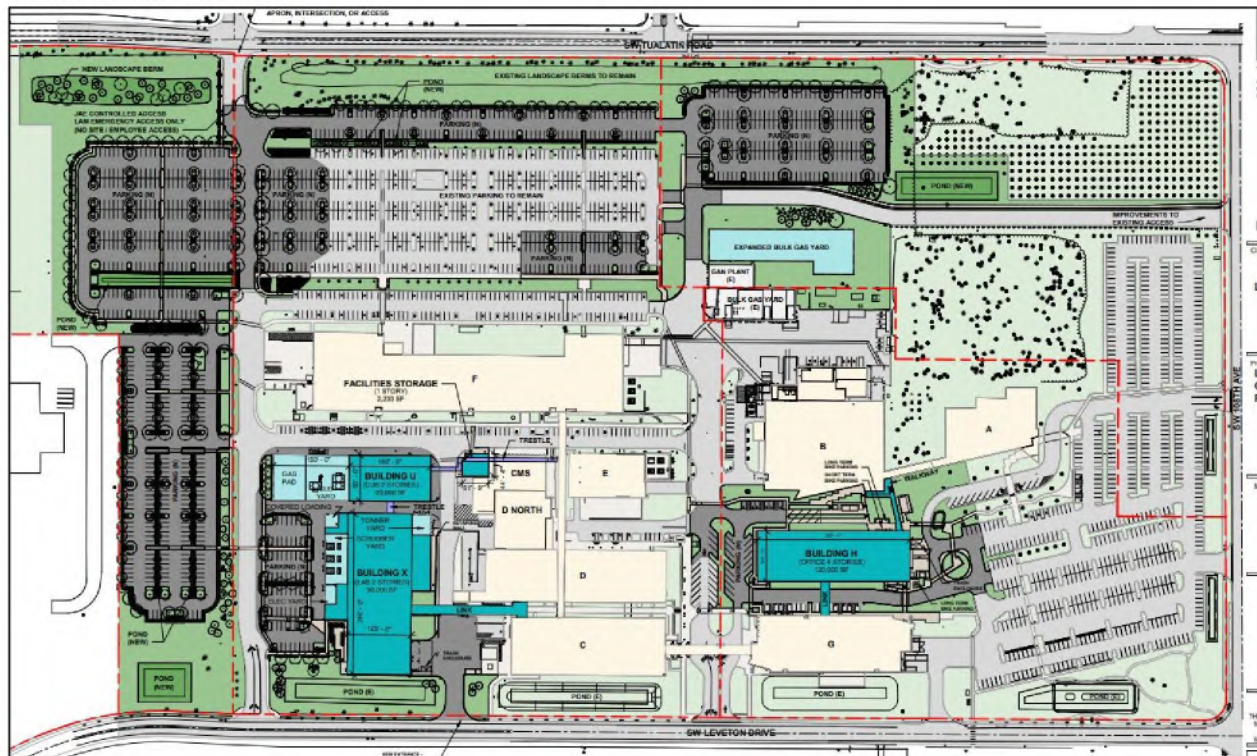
Site Plan (overview, dark gray and blue areas are locations where new development is proposed)
